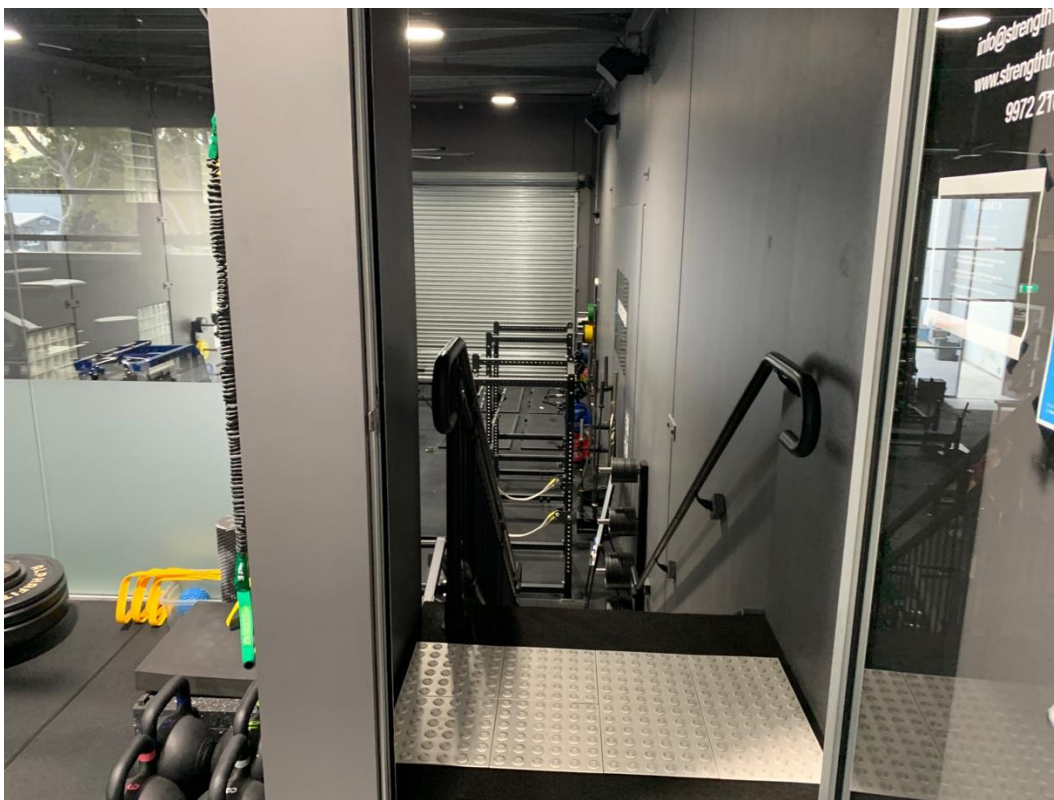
Stairs access connecting the first and mezzanine floor (Corona Projects, June 2021)
